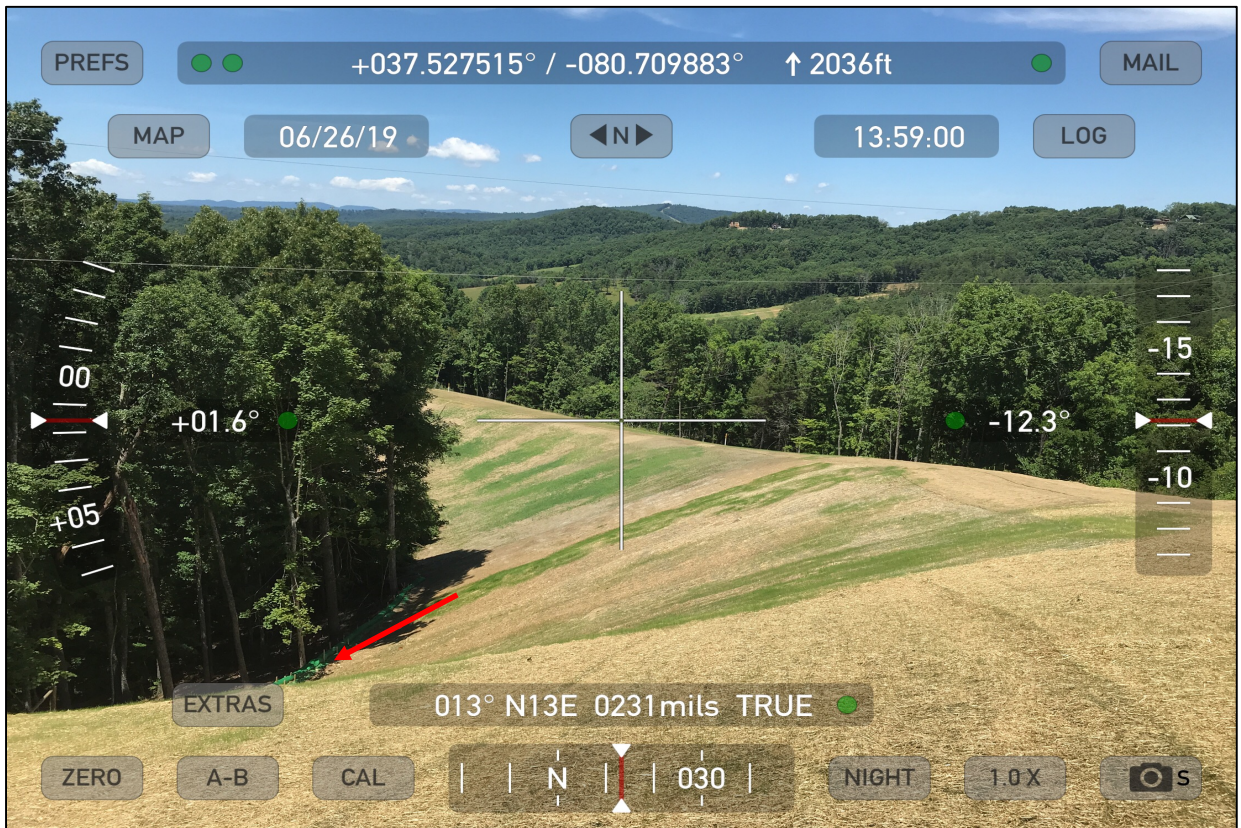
Photo illustrates the permanent stabilization and CFS that have been installed near Station 9780+00.
